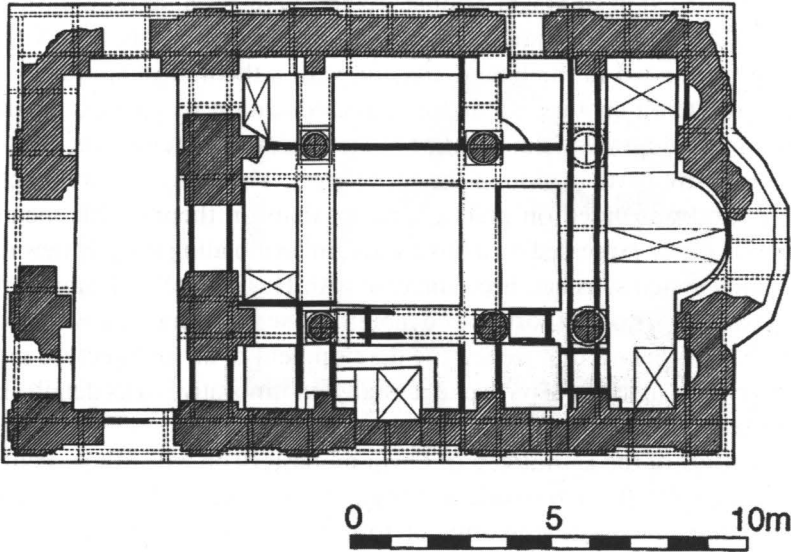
Plan of the foundations of church E at Sardis (Buchwald)
